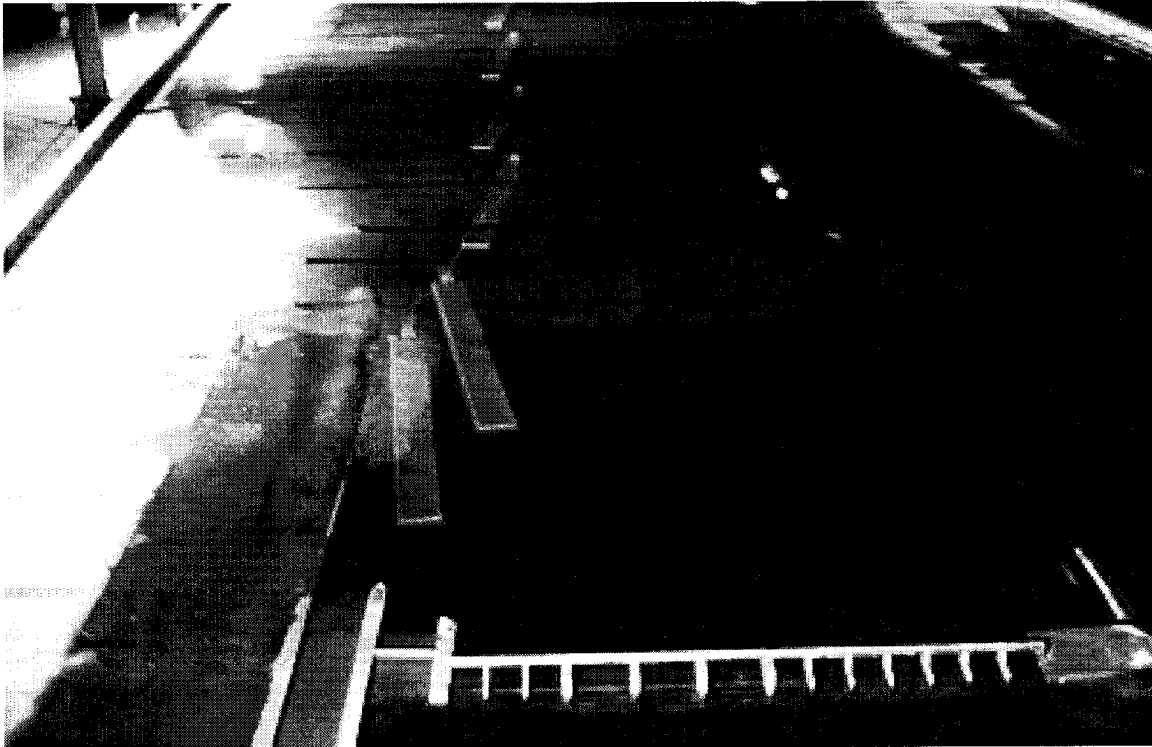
Existing conditions. looking upstream. discharge 162,000 cfs, path of downbound tow approaching 600-ft lock
